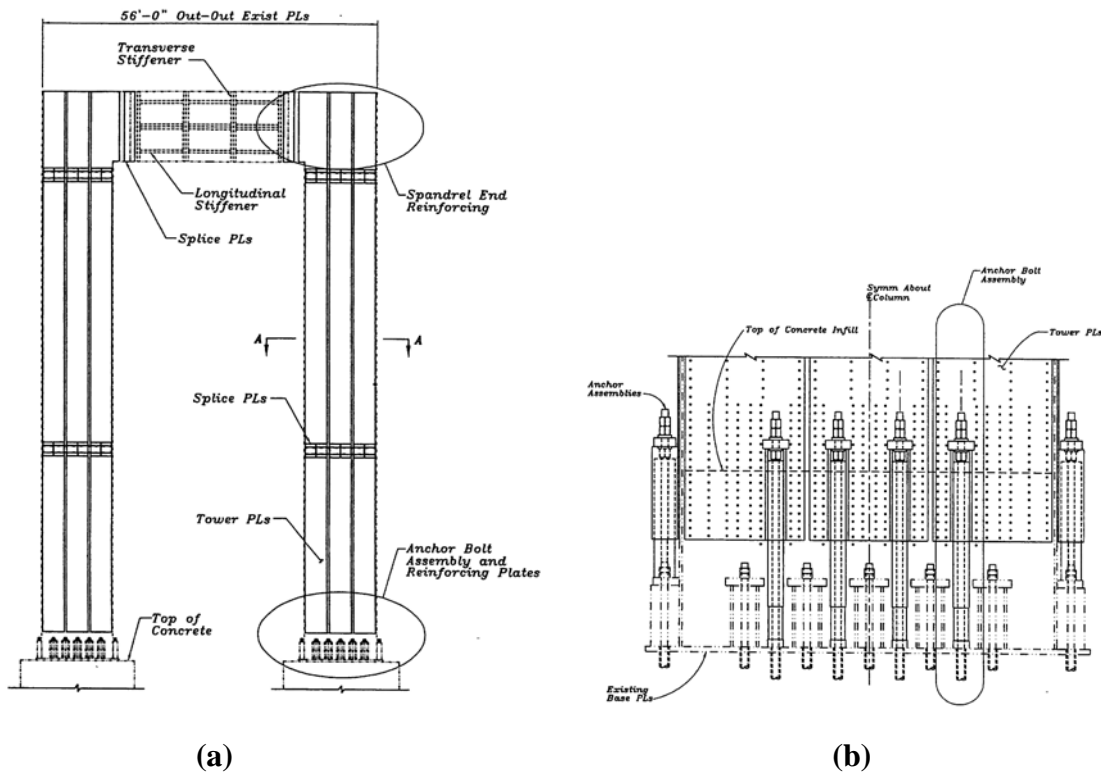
San Mateo-Hayward Bridge (a) Steel Tower and (b) Modified Anchorage Connection (Prucz et. al., 1997)
